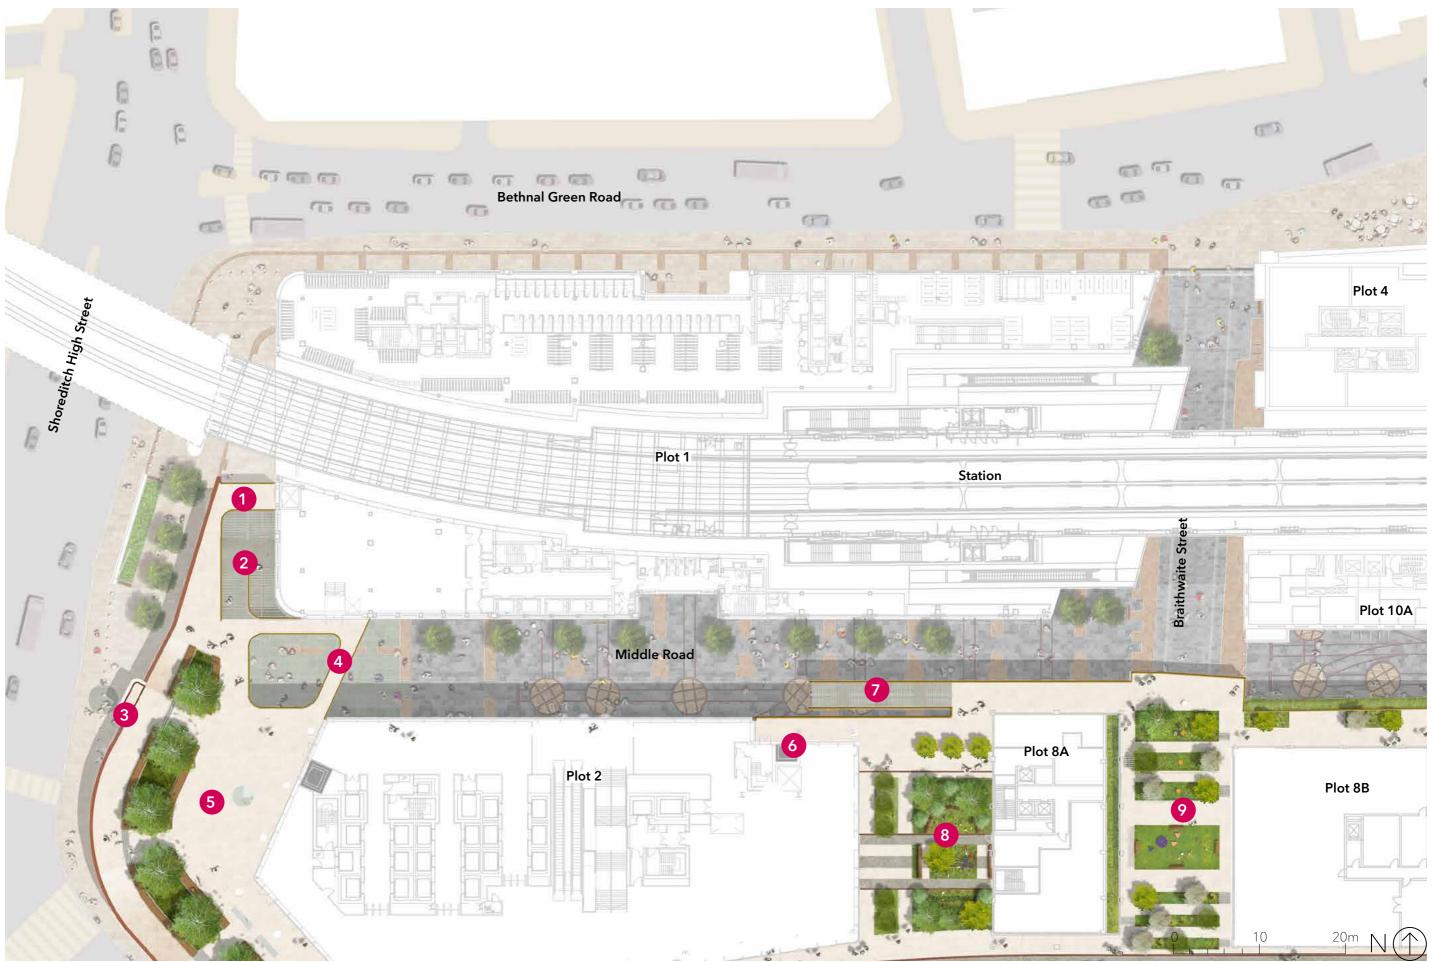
Illustrative Plan - Station Gateway + Bethnal Green Road
